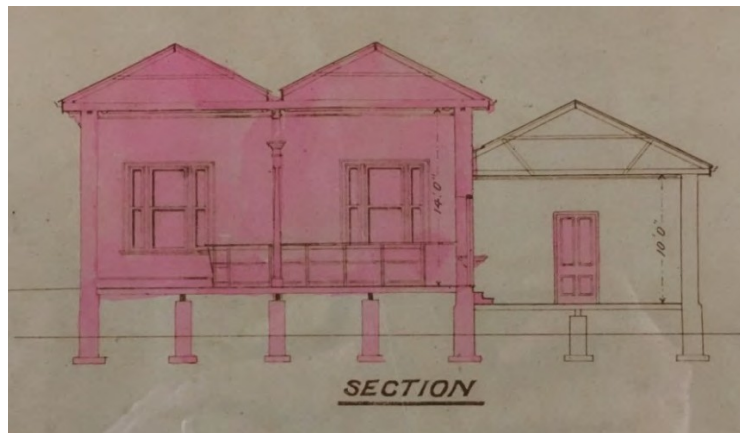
Section through new refreshment room showing raised timber floor. Source: QSA Series 17692 Plans of Queensland Railway Station Buildings etc., Item ID 120966
